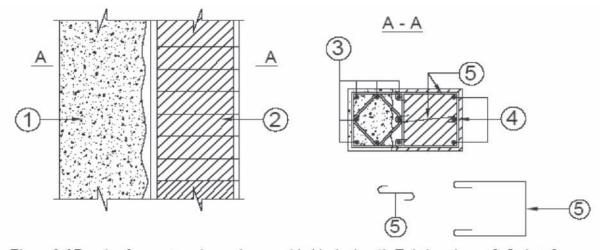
Repair of concrete columns by one-sided jacketing (1. Existin column; 2. Jacket; 3. Existing reinforcement; 4. Added longitudinal reinforcement; 5. Added ties )
